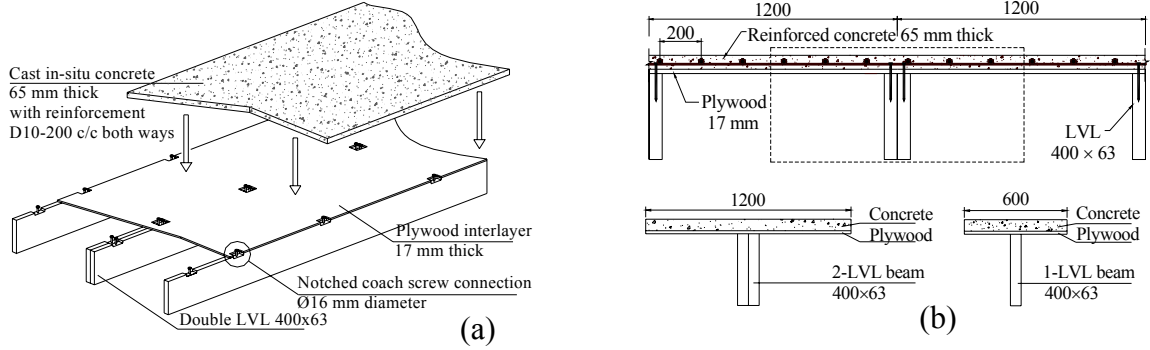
(a) Semi-prefabricated panels; (b) Reduced T-section (dimensions in mm)
